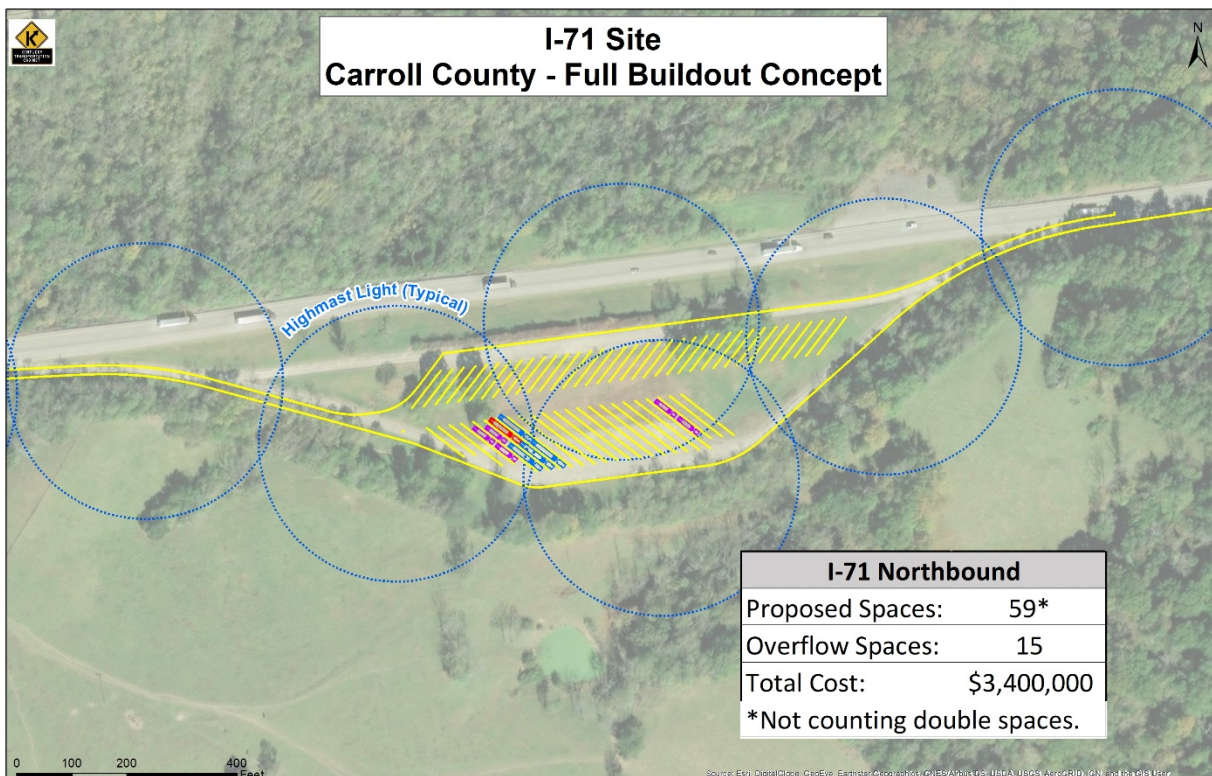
Conceptual Example Layout for Northbound I-71 in Carroll County (note double parking spaces on south side)
